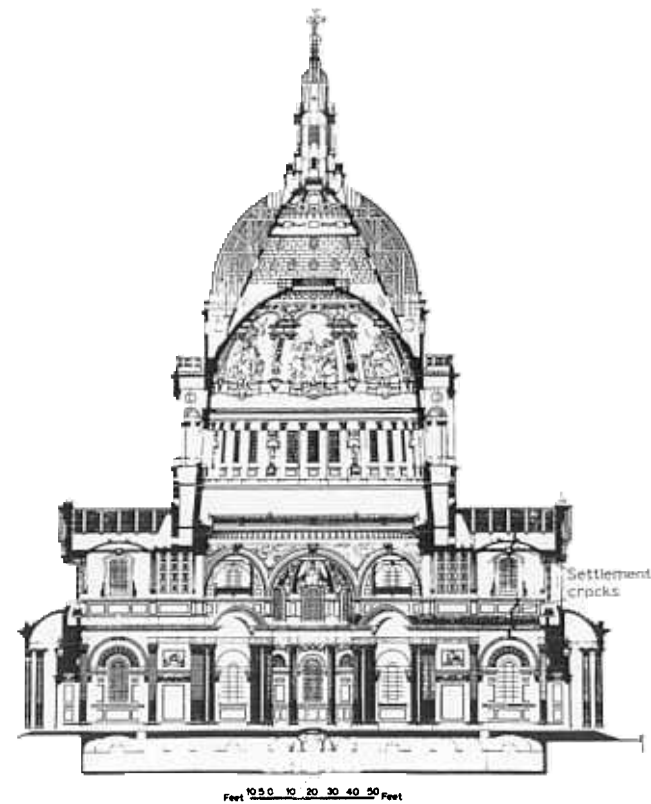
St. Paul's Cathedral, London: cross section looking east showing the site of settlement cracks bridged by electronic transducers.
